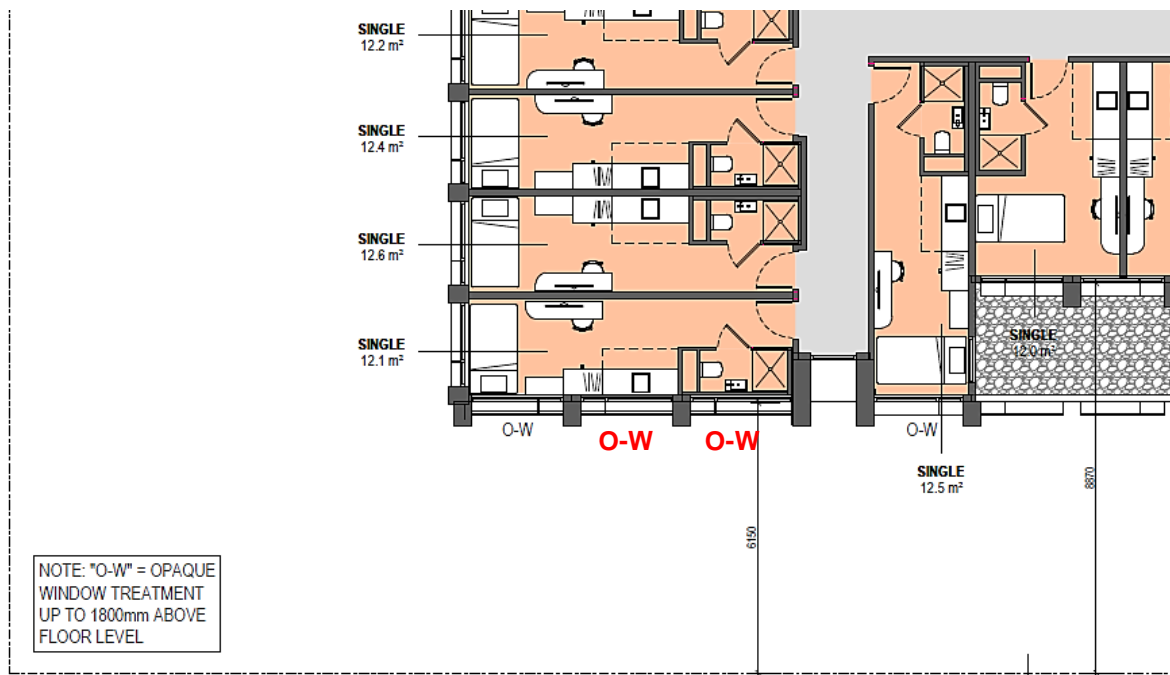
Extract from the Level 6-12 Plan showing the windows on the southern façade with an opaque-window treatment to a height of 1.8m above floor level (marked as 'O-W').
